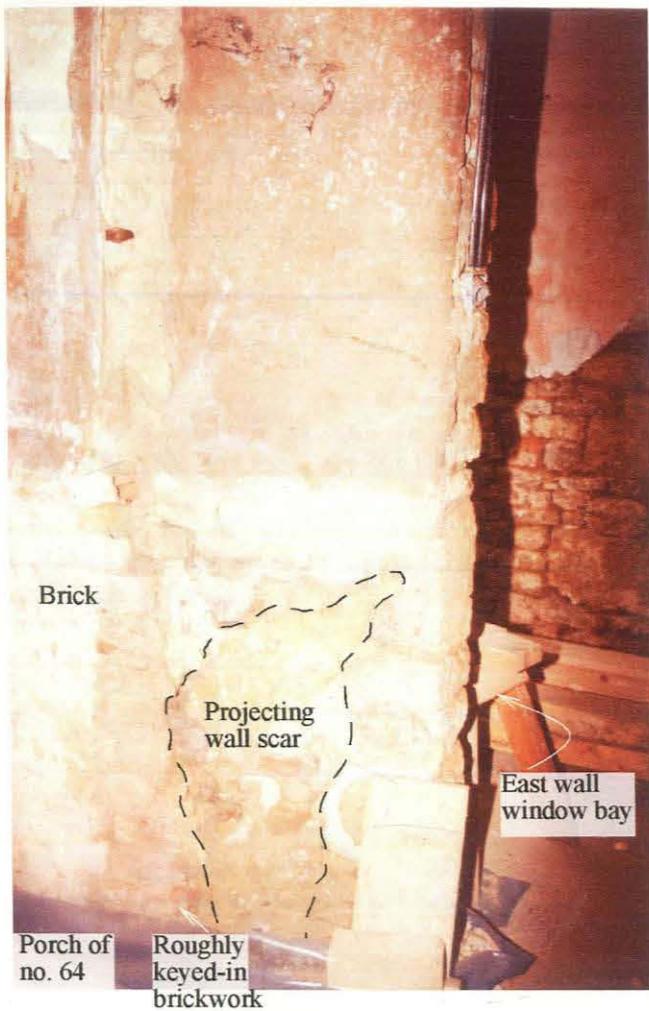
Front room 64/1, no.64, looking southeast; view of the western end of the southern section of porch wall. Note the roughly keyed-in brickwork built into the east side of the existing rubble wall, and the wall scar on the north face of the rubble wall.
